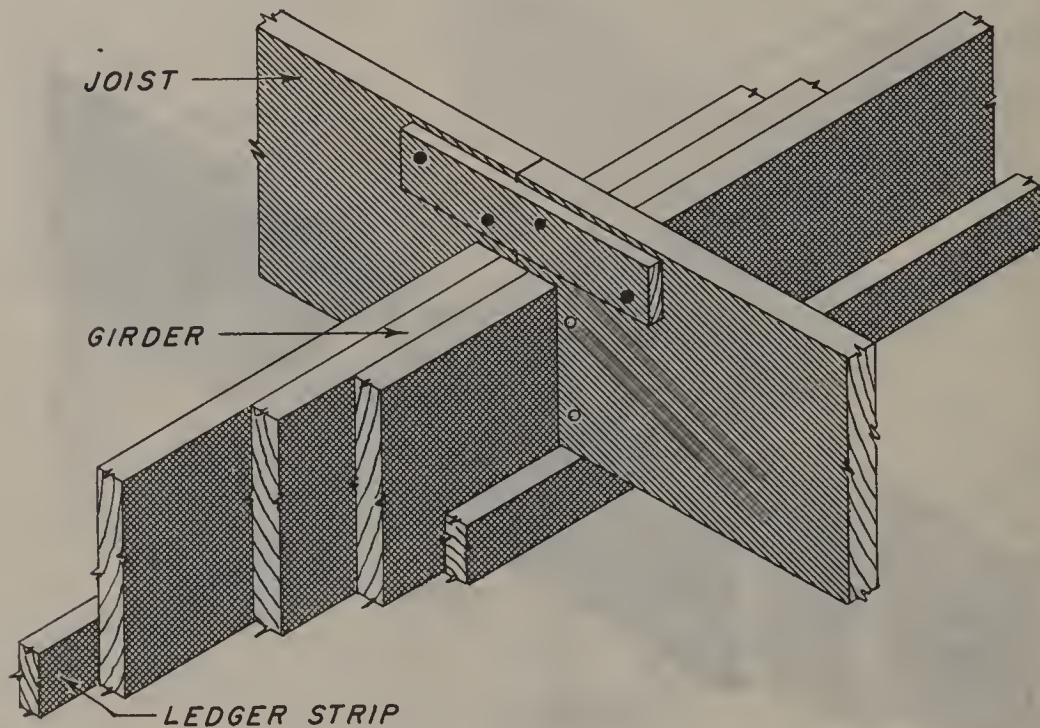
Joists notched over girder and bearing on ledger strip. Each joist toenailed to girder with two tenpenny nails, one near bottom of joist, other on the same or opposite side near top of girder. Wood strip nailed with two eightpenny nails in each joist furnishes additional tie. Note: Clearance is provided in the notch over the girder so that the joists bear only on ledger strip.
